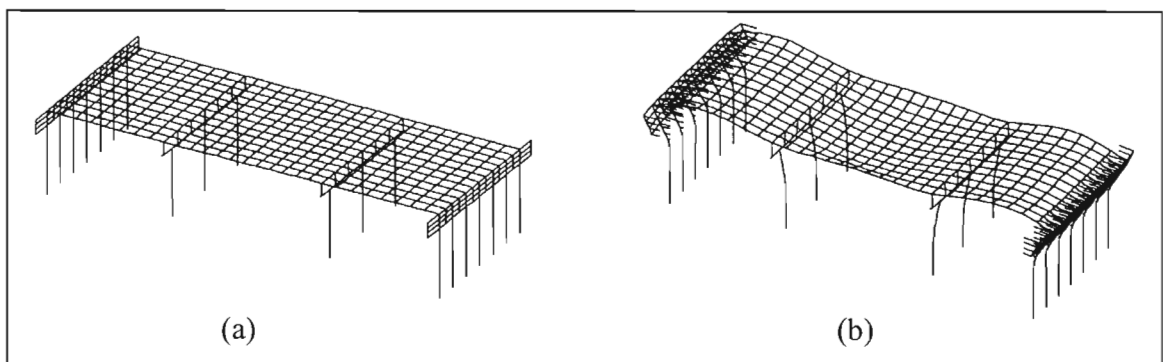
3D Finite element model (a) in undeformed state (b) after thermal loading (Faraji et al, 2001)
